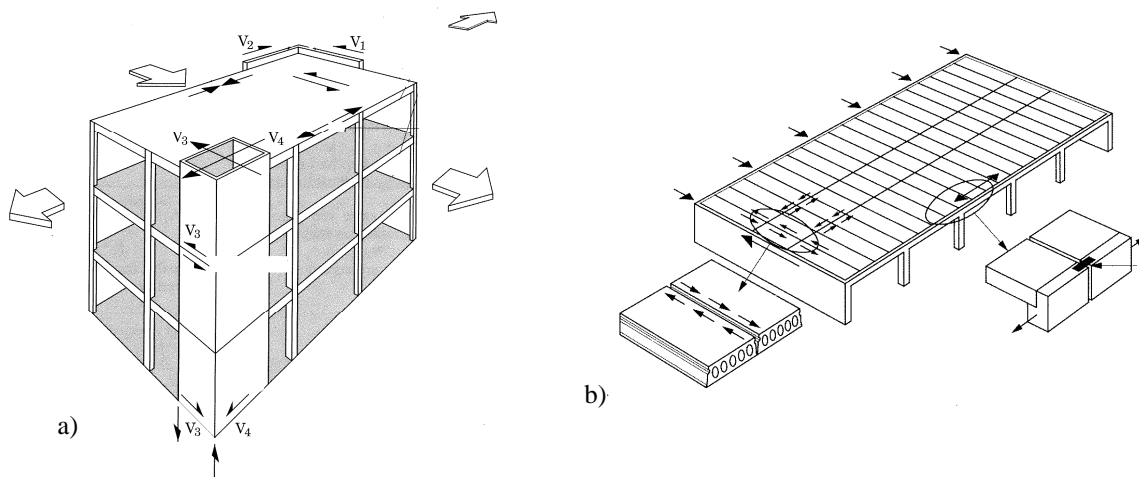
The connections should be designed consistently with the intended structural behaviour, a) global structural system, b) floor diaphragm as a sub-system
